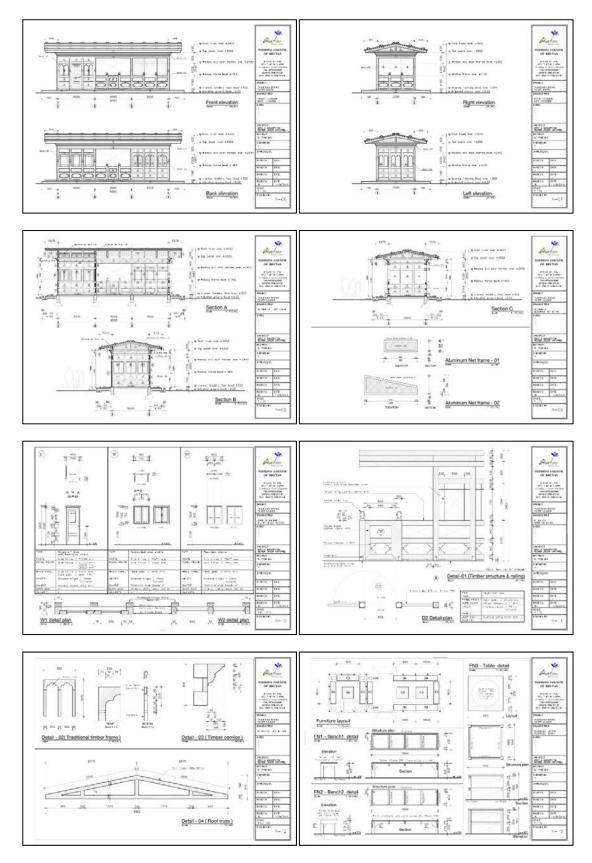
Construction drawings of Tashichho Dzong tourists lounge.
